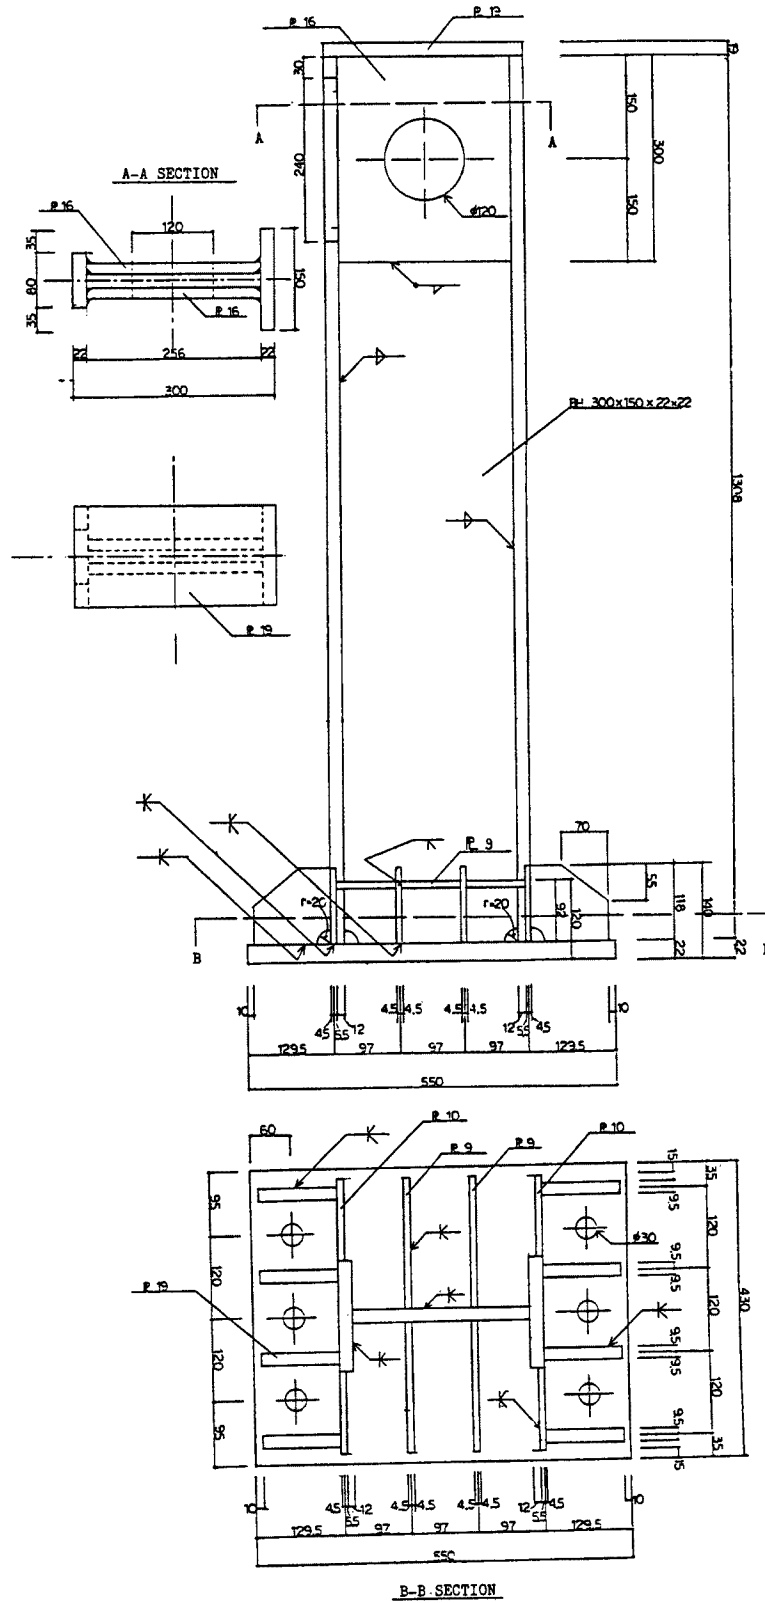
(a). Steel column used for E or F-Type specimen (Unit: mm).
